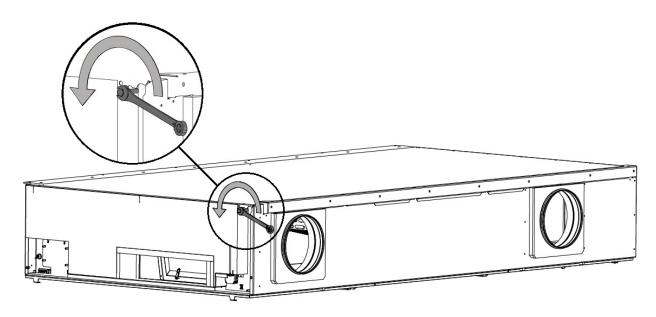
Disassemble the rear bracket, left-hand side seen from behind
